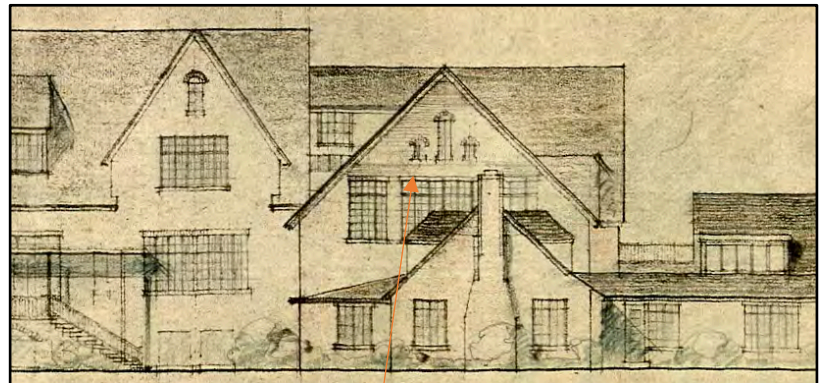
Elevation from 1937 plans showing the 1925 West Wing profile and the placement of the new addition behind. From Elliott Miller's archive.
